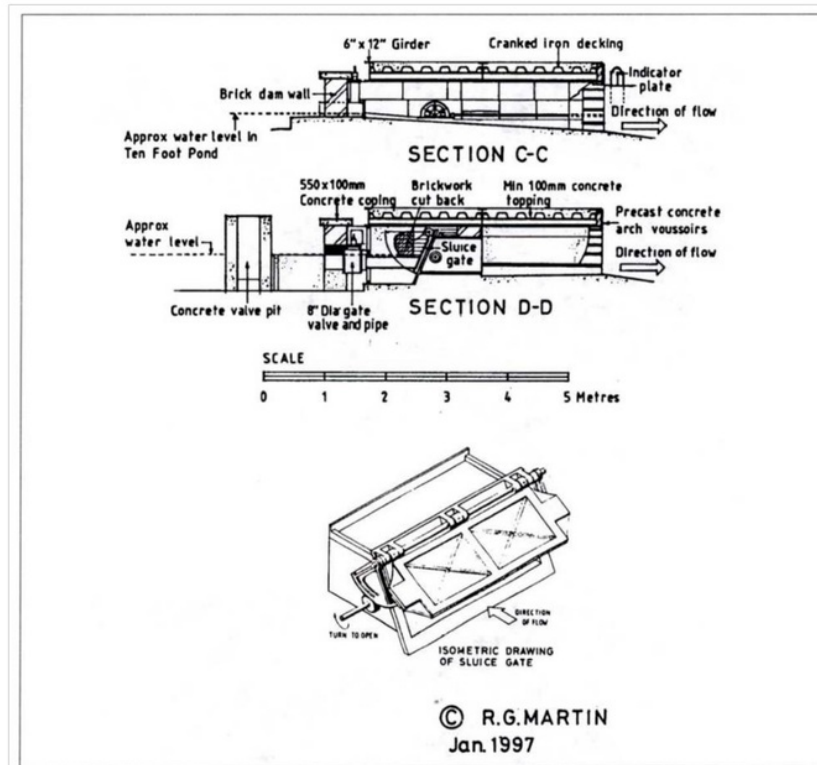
Sheffield Park – 19C sluice design from engineering survey.
